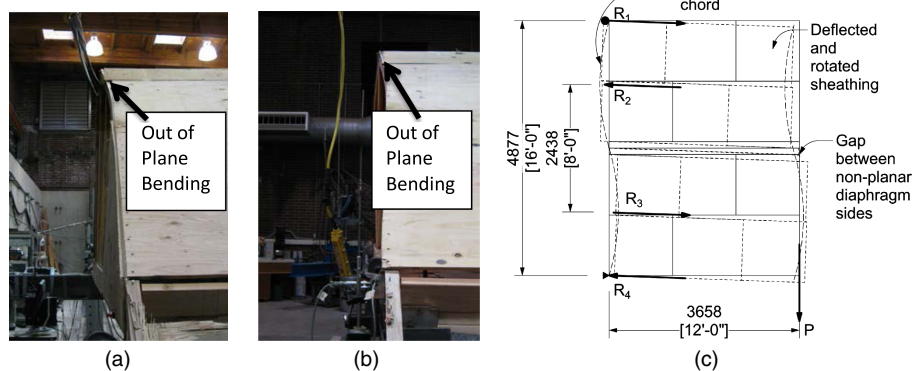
Observed out-of-plane truss chording: (a) west end from SW corner; (b) east end from northeast corner; (c) forces developed in tested roof
